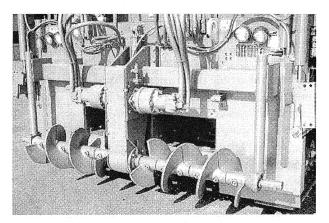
Paver auger with gearhousing at midpoint equipped with reverse paddles.
